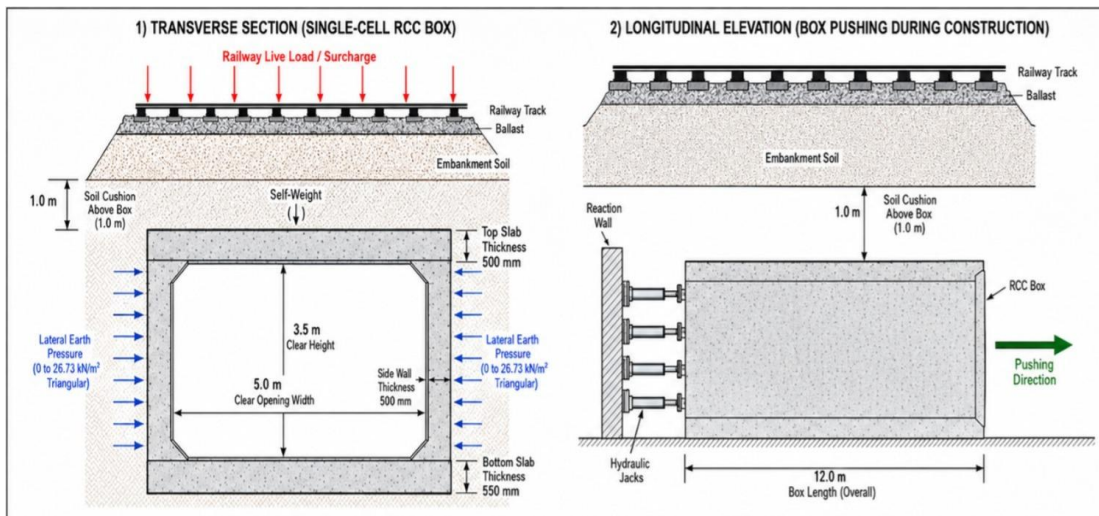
Typical transverse and longitudinal loading arrangement for RCC box under embankment and surcharge.
